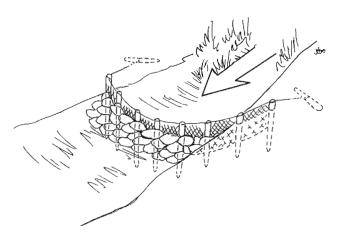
A. A single-fence gabion, perspective view. The bottom of the woven wire fencing is buried in the anchoring trench. Posts are placed 2.5 to 3 feet (0.75 to 0.9 m) apart on the downslope side of fencing. Connecting 9-gauge wire is wrapped around the top of all posts along the top of the fencing, and is then anchored into the banks via buried anchors or "dead men." Rock or brush apron stabilizes overflow. Fencing is put in like a banana, and bowed somewhat downstream. The dip in the center of the gabion could also be a "V" made by running two sections of fencing from either bank, or by cutting and folding one section of fence.
